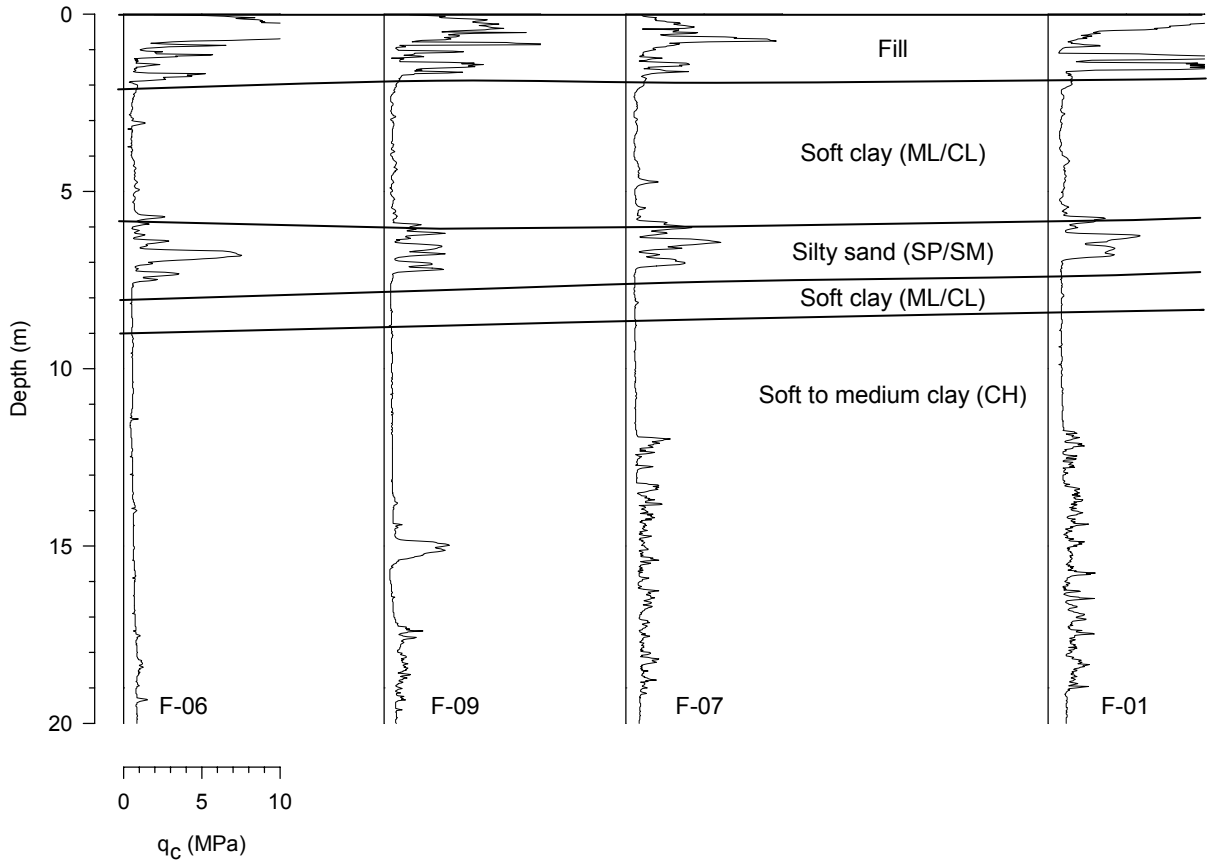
Cross section of soil layering – Lot C (section C-C)
